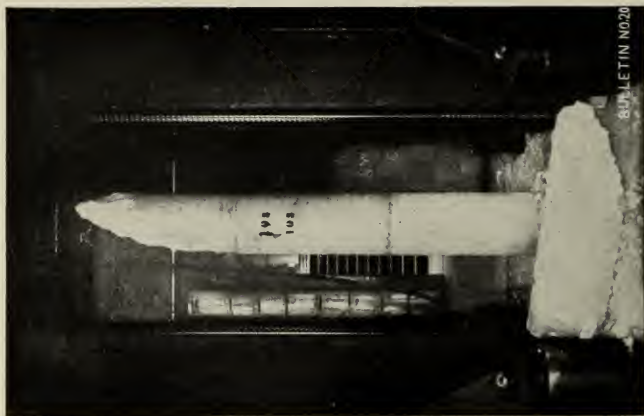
VIEW SHOWING DIAGONAL SHEARING
